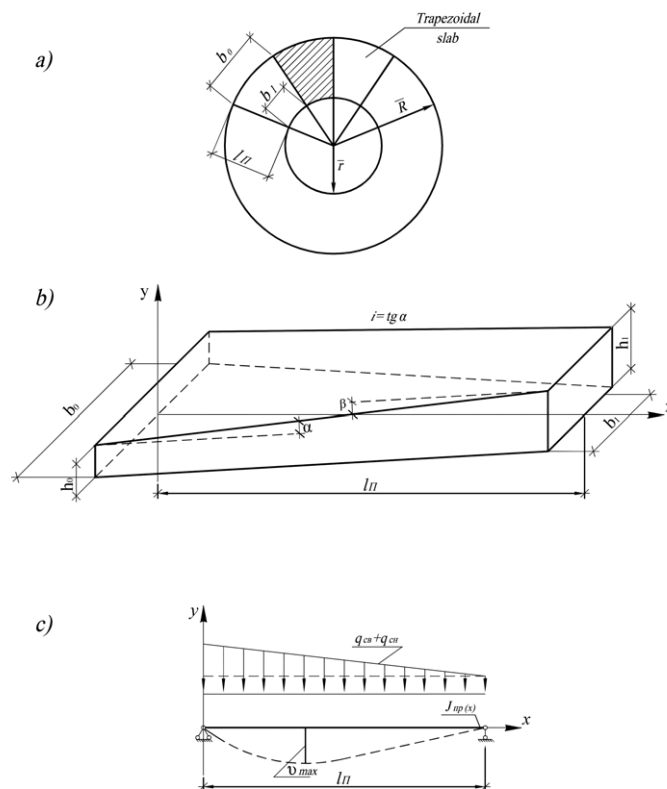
The trapezoidal slabs calculation: a – designation of building parameters with a circular plan; b – designation of slab parameters; c – design diagram
